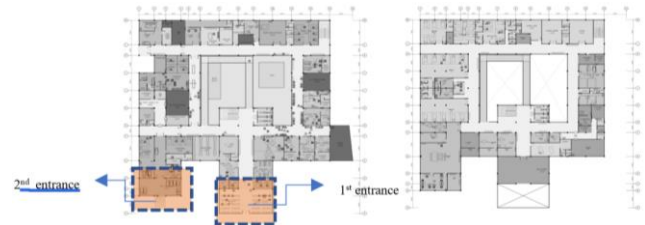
Existing floor plan of the Siantan Hilir public health care.
